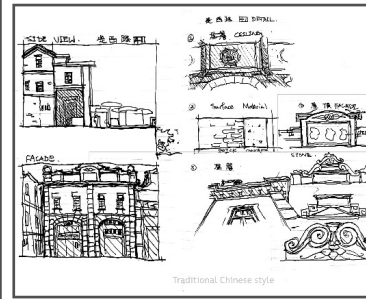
Façade details of the arcade building at 41 West Embankment Street, Chikan Ancient Village, Kaiping
